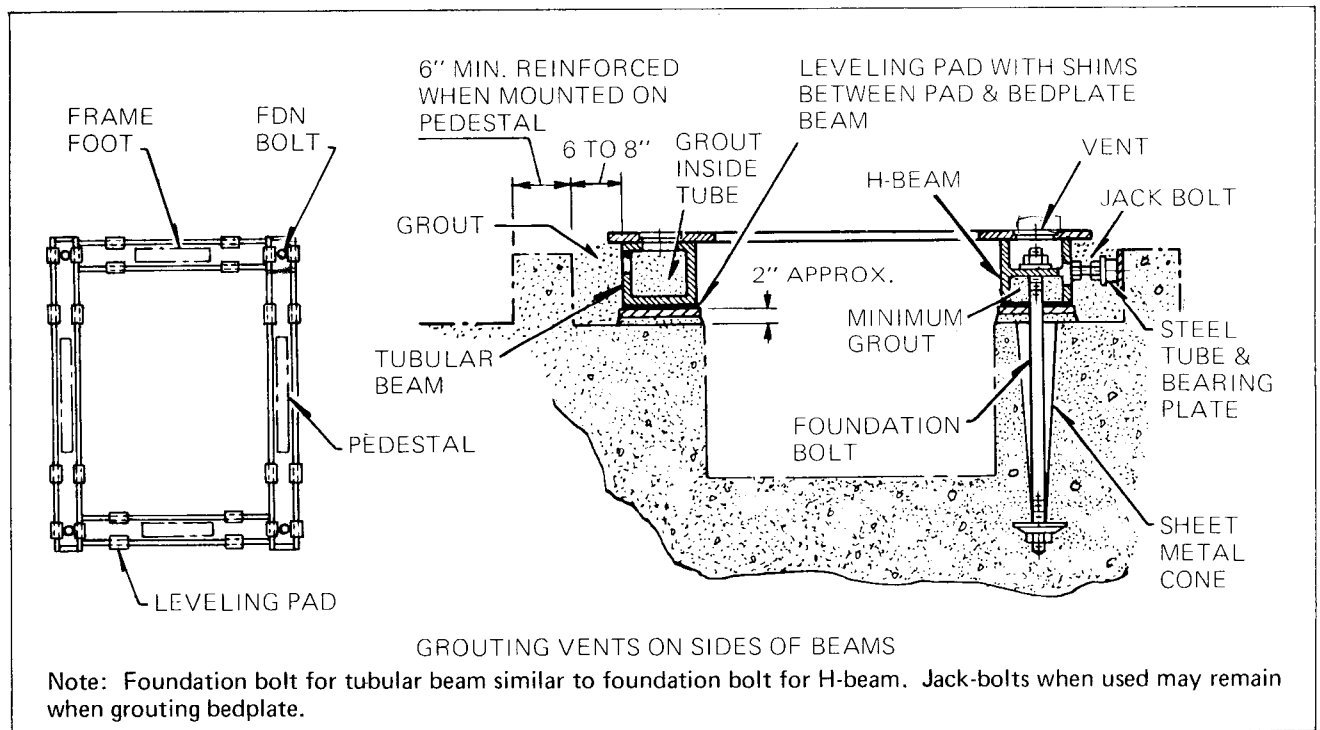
Method of Anchoring Foundation Bolts and Typical Arrangements of Bedplates, Leveling Plates and Shims
